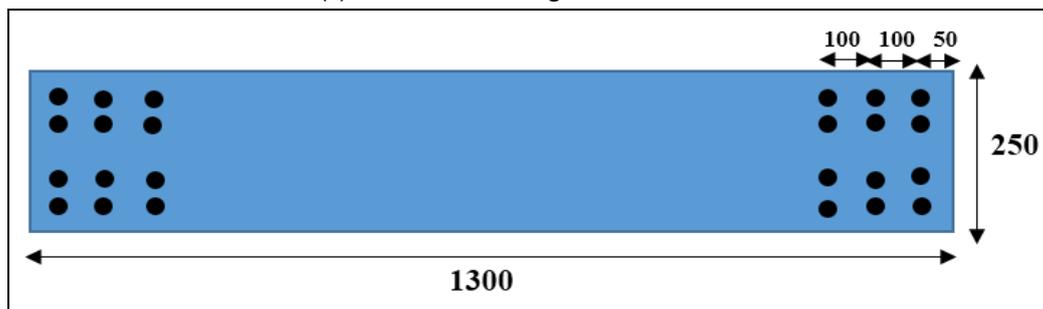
Details of steel plate with shear connector (Bottom view) (all the dimension in (mm))
